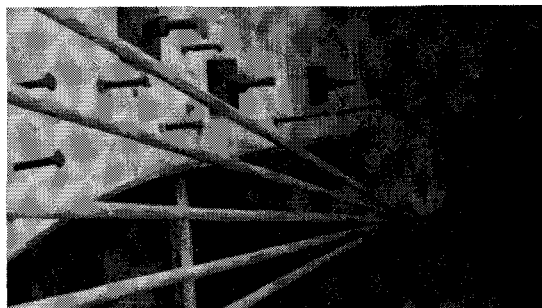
Strands and Saddle at Bent 43. Note Encasement Steel Extending from the Beam.
